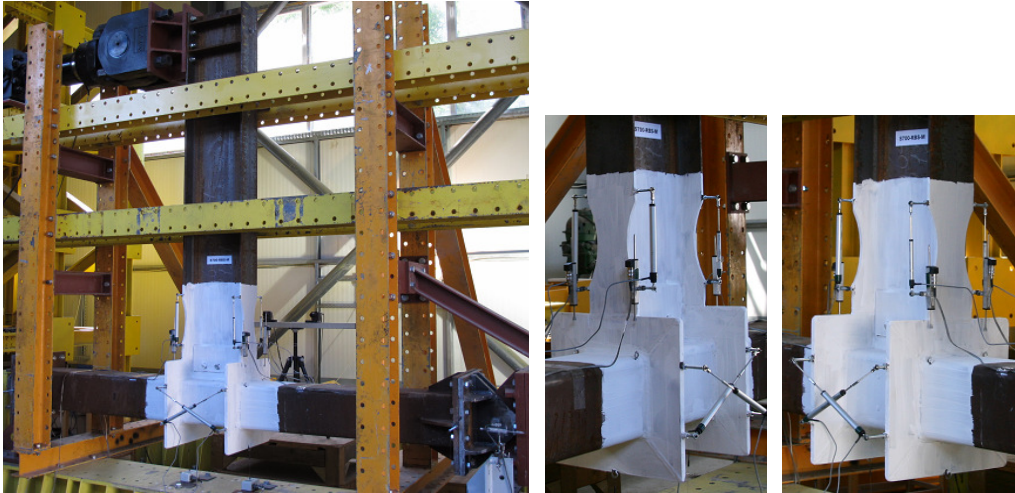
S700-RBS test assembly and connection zone – before test
